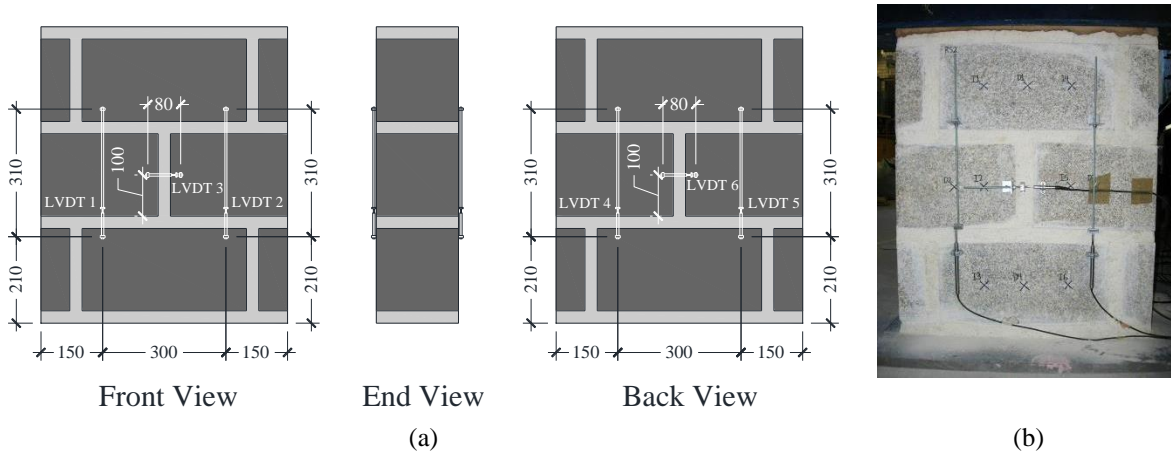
Regular masonry wallet LVDT locations: (a) dimensions in mm; and (b) photo of LVDTs attached to the RS2 wallet
